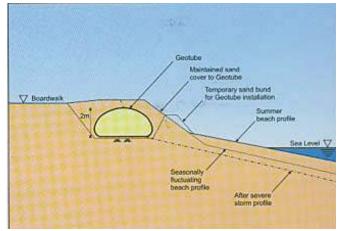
Cross Section of the Geotube Retaining Wall
